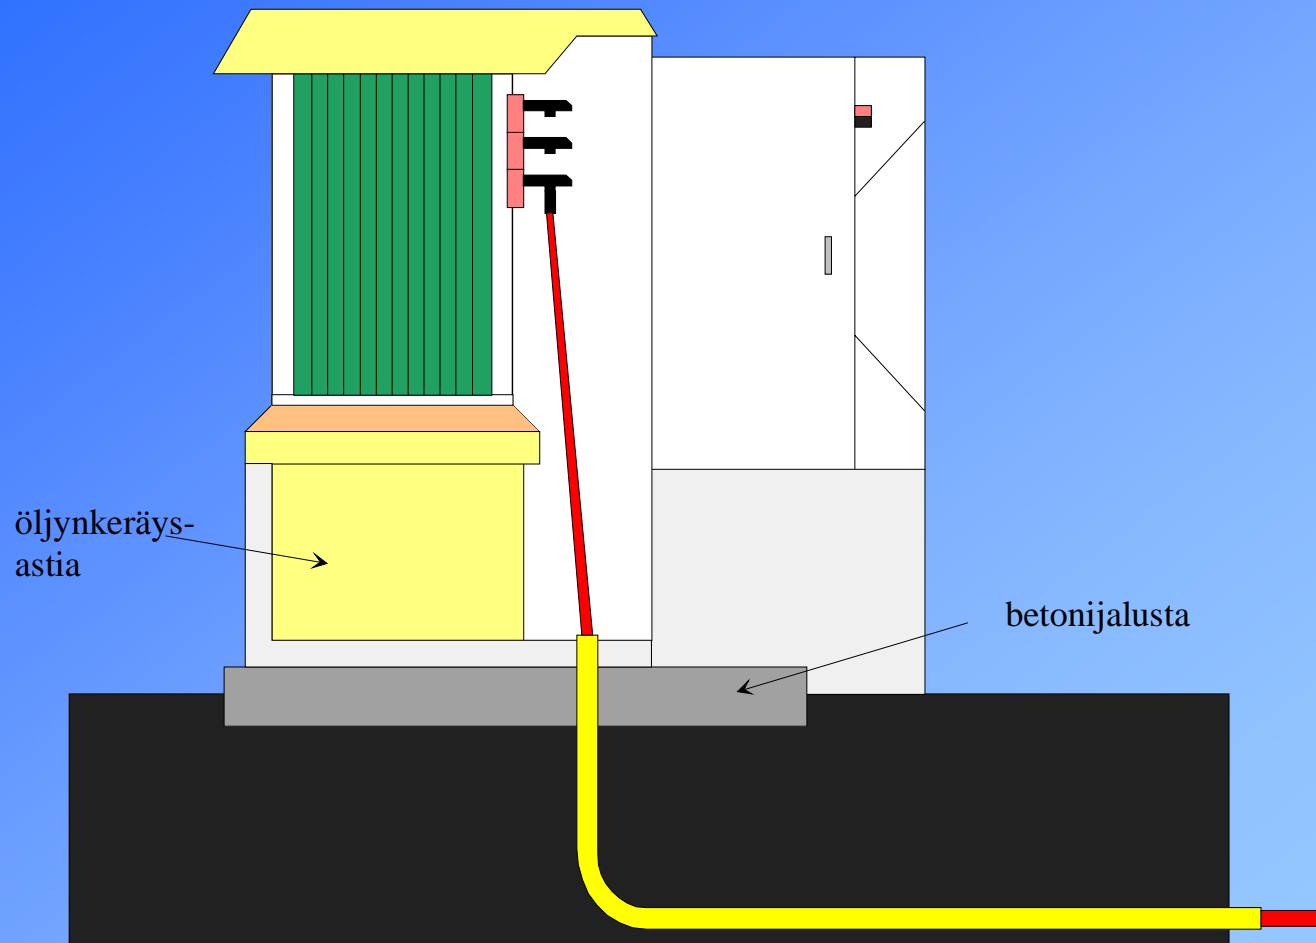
Typical prefabricated pad-mounted MV/LV substation
